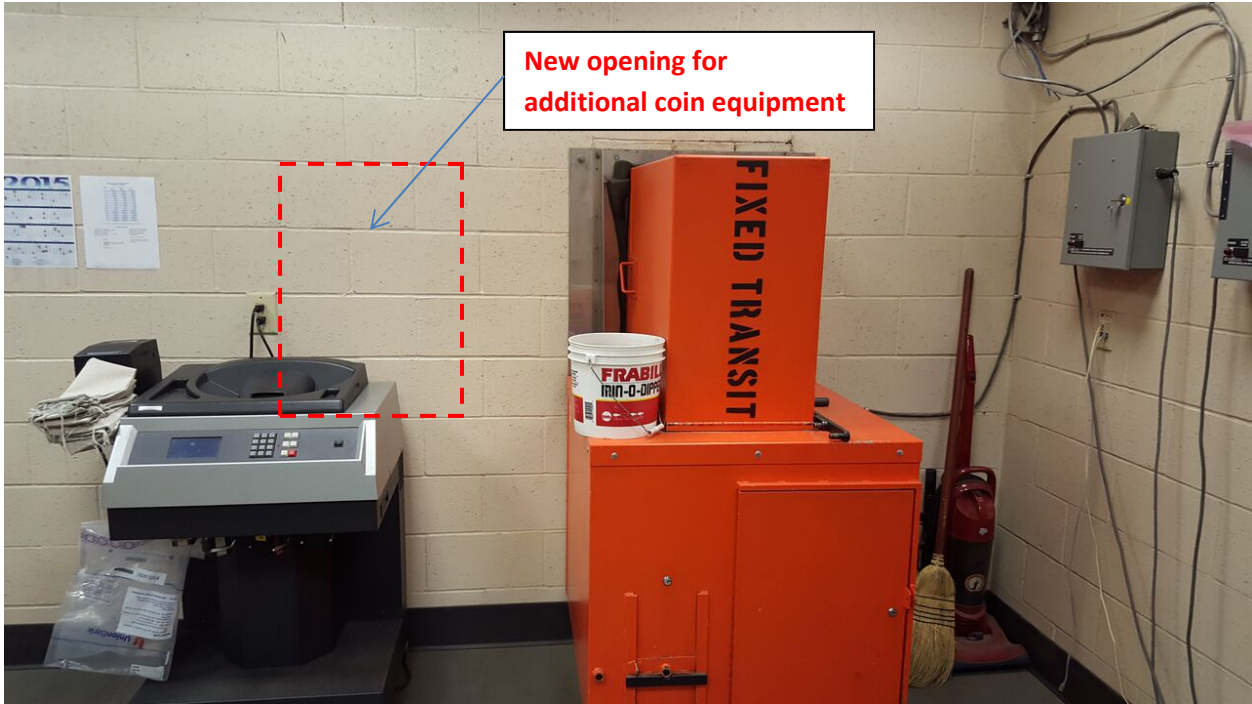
Existing coin equipment on south wall. Proposed coin conveyor equipment (by AVTA) will be placed in front of equipment
